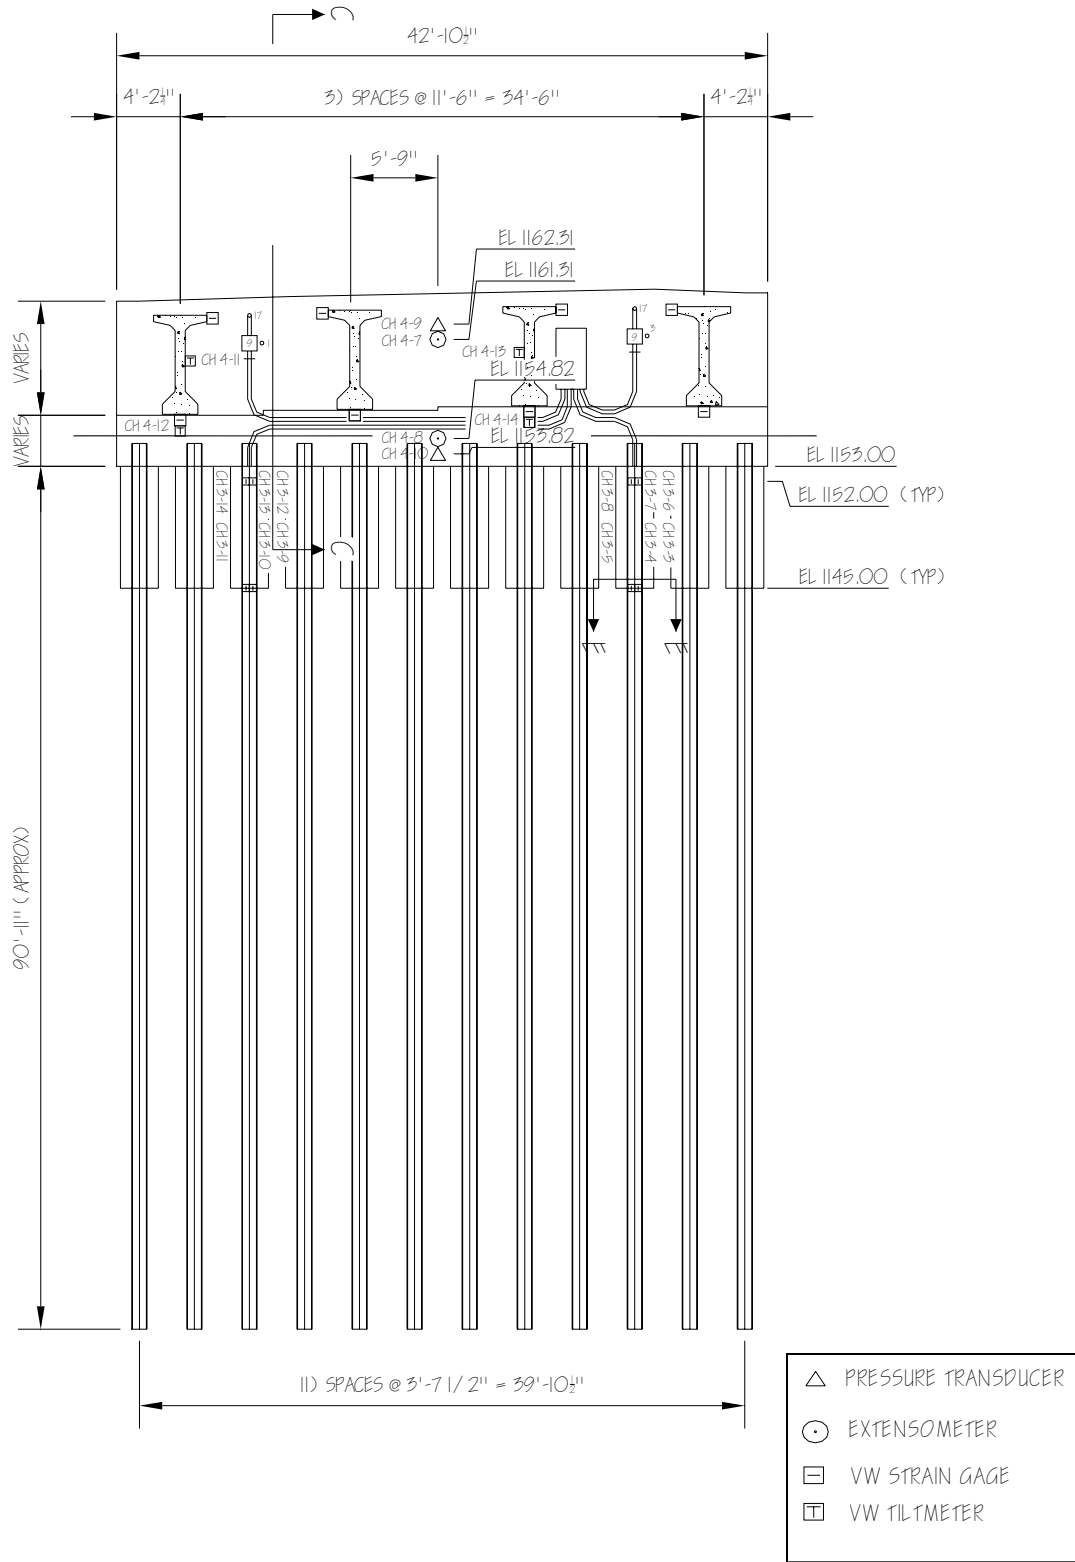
Structure 109 Abutment 1 Elevation (Section D-D)
